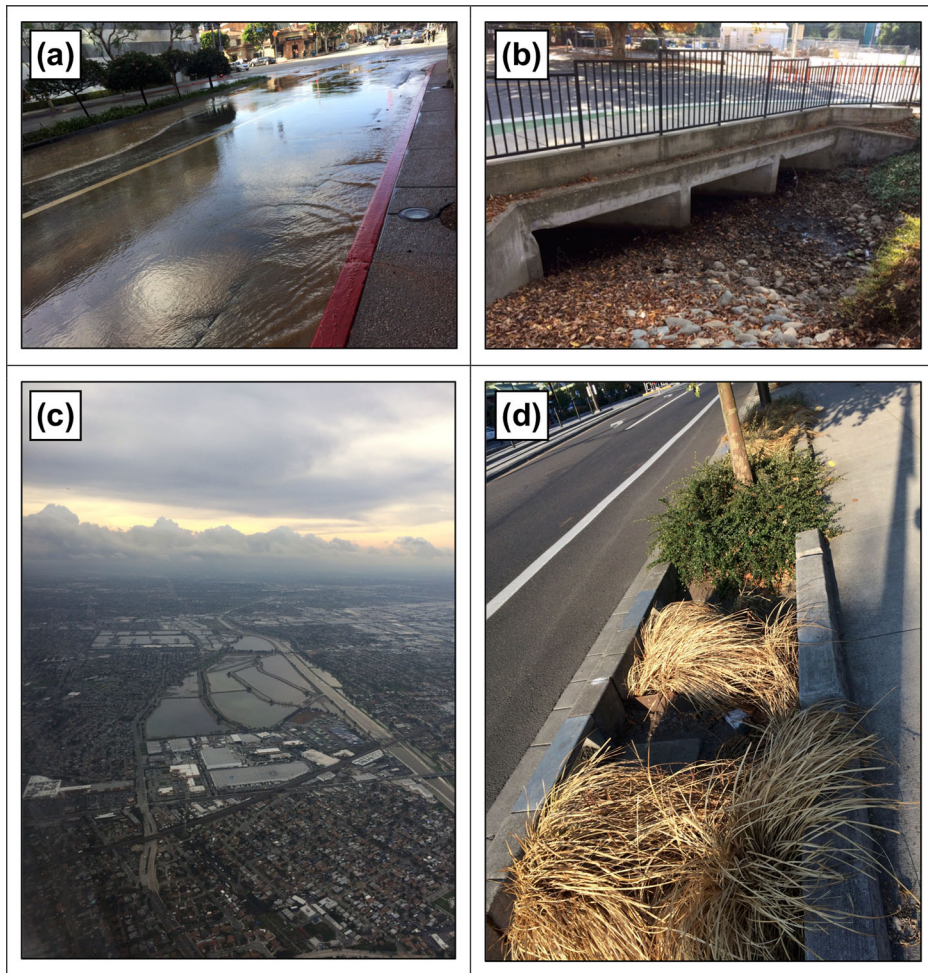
Examples of green and grey infrastructure for managing stormwater: (a) Street conveyance to storm sewers (Los Angeles, CA); (b) Concrete culvert underlying a bridge (California State University Sacramento); (c) Rio Hondo Spreading Grounds in Los Angeles for capturing and infiltrating stormwater; (d) Streetside infiltration swale (Portland, OR) (Source: Author photographs).
